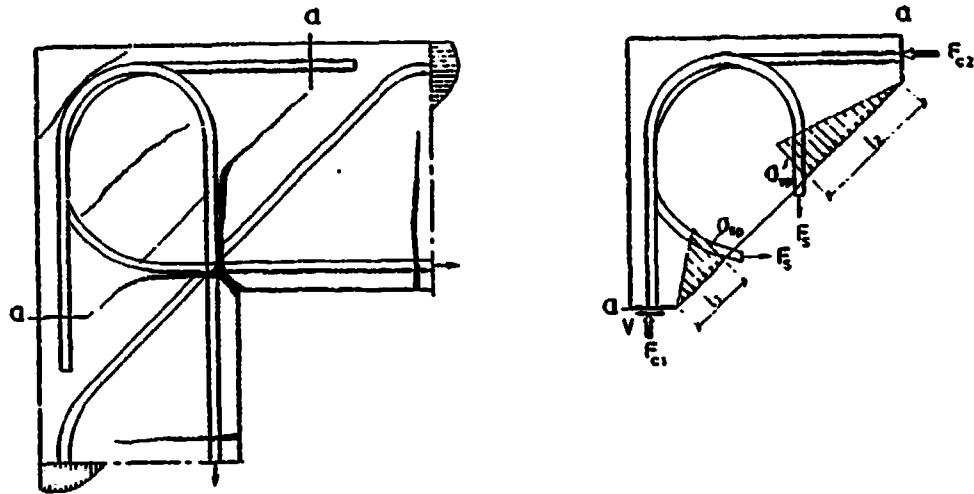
Crack pattern and forces acting at failure stage. (Nilsson '73)
